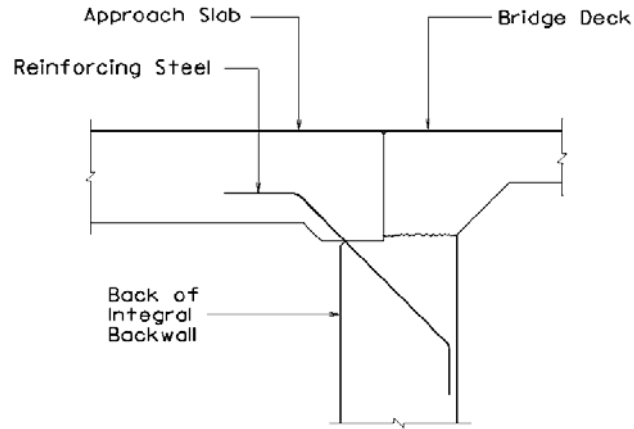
ODOT and VDOT approach slab-backwall connection detail
